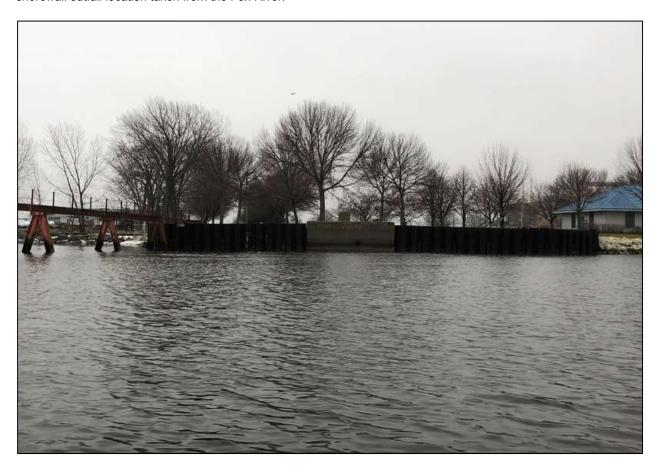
View of the GBF Outfall (Concrete Shorewall).
